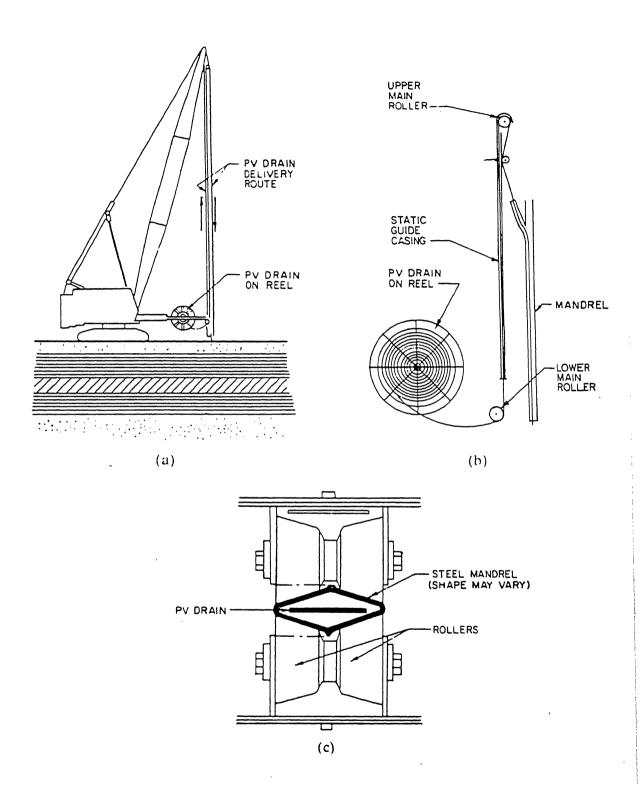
Installation of prefabricated vertical drains: (a) crane mounted installation rig, (b) drain delivery arrangement, and (c) cross section of mandrel and drain (after Rixner et al.,1986).
